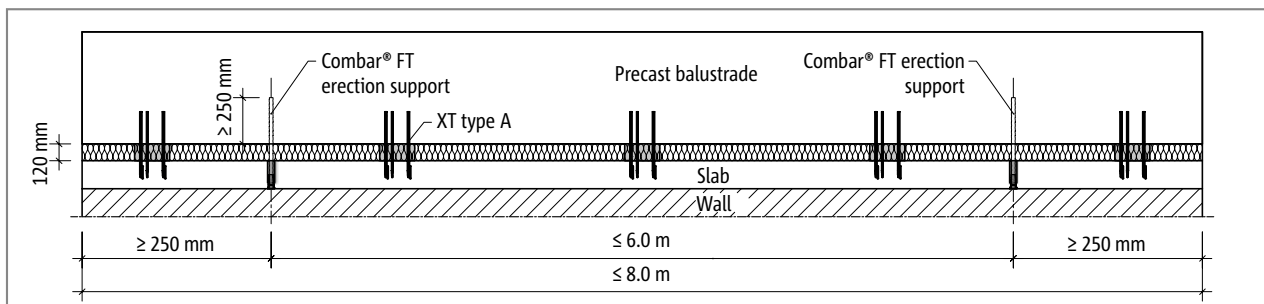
Schöck Isokorb® XT type A with Combar® FT erection support: Edge distance and minimum bond length in the prefabricated parapet
